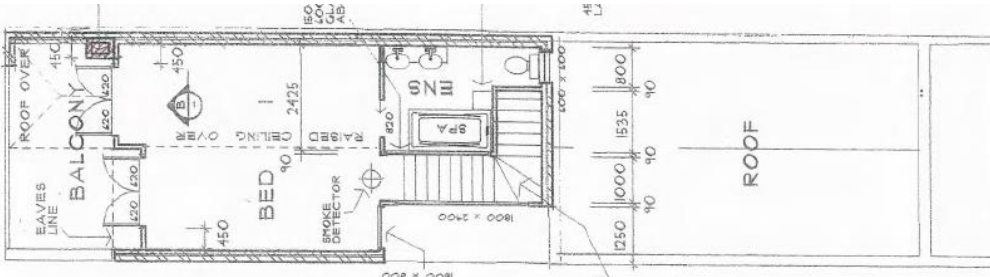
First floor plan of No. 24 Grant Street showing balcony with access from a bedroom (Planning Permit No. PLN12/1037)
